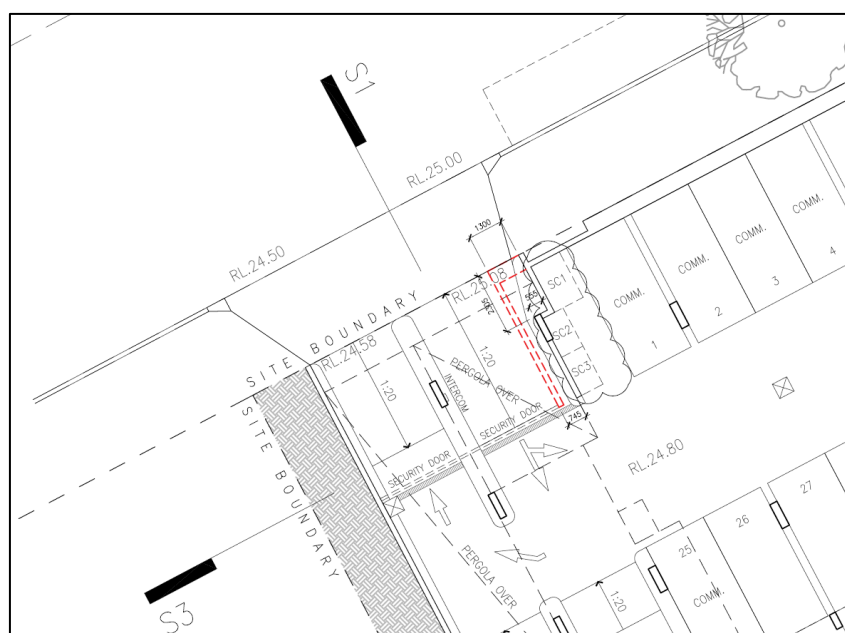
Extract of the proposed basement plan indicating the location security door and intercom to gain access to the basement car park.
